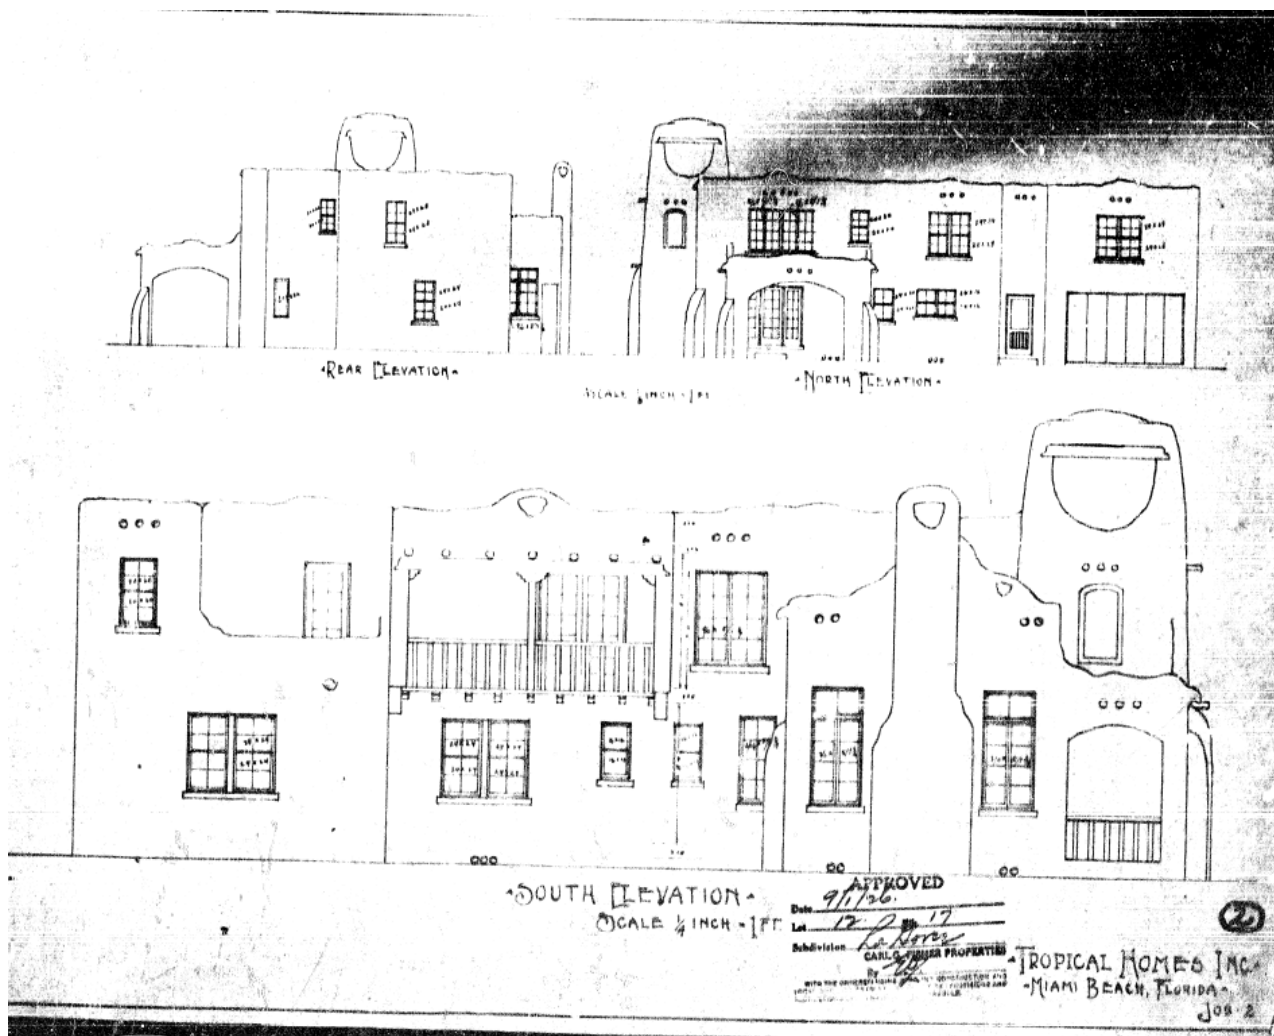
Original Elevation Plans for 5208 Alton Road, September 1, 1926.
